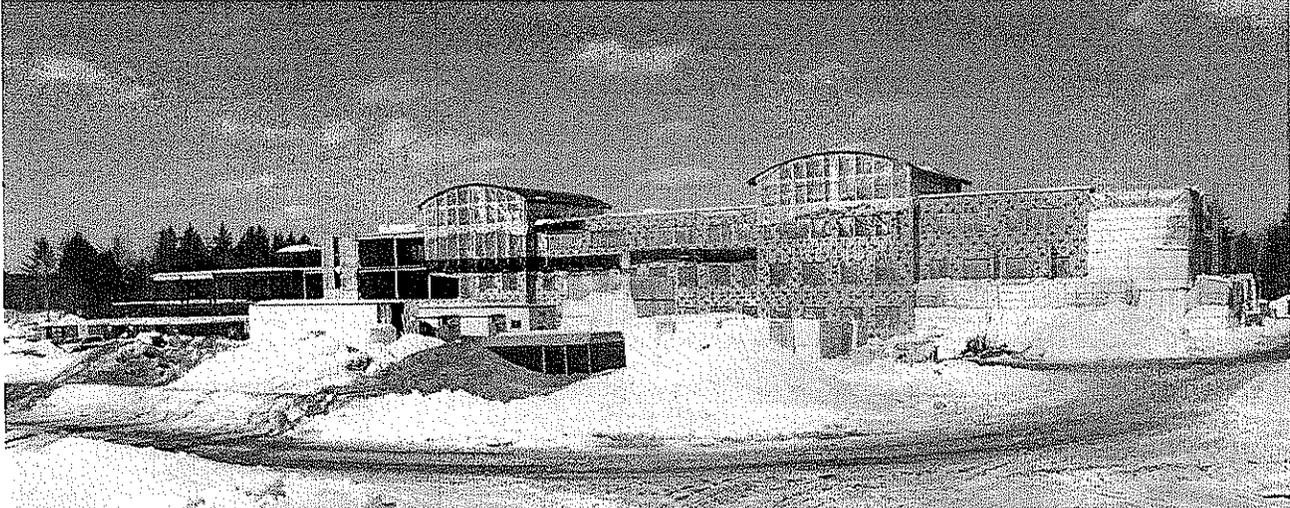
View northwest toward the Classroom Wing, February 11, 2011.
